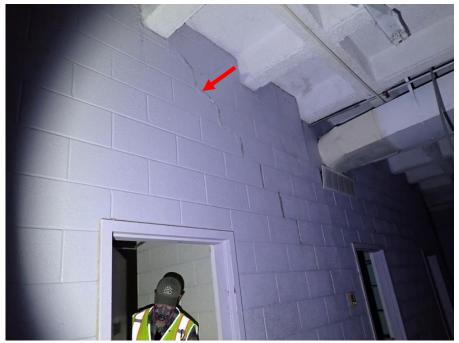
Sealant installed at stepped crack in interior CMU wall.
